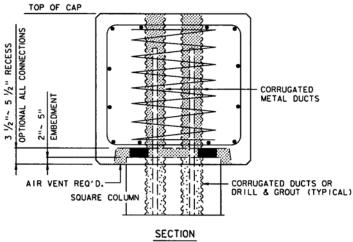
Single-line Grout Pocket on Pile (Embedded Option)
